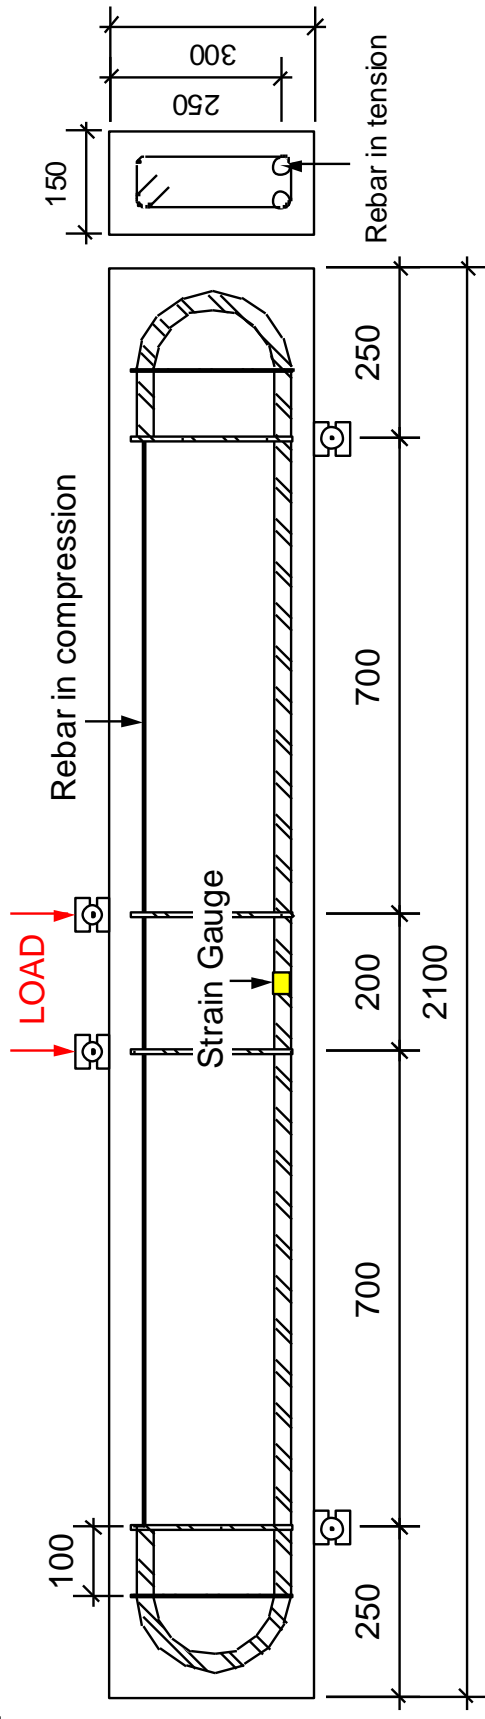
Dimensions and reinforcement details of RC-00 or RE-00.
